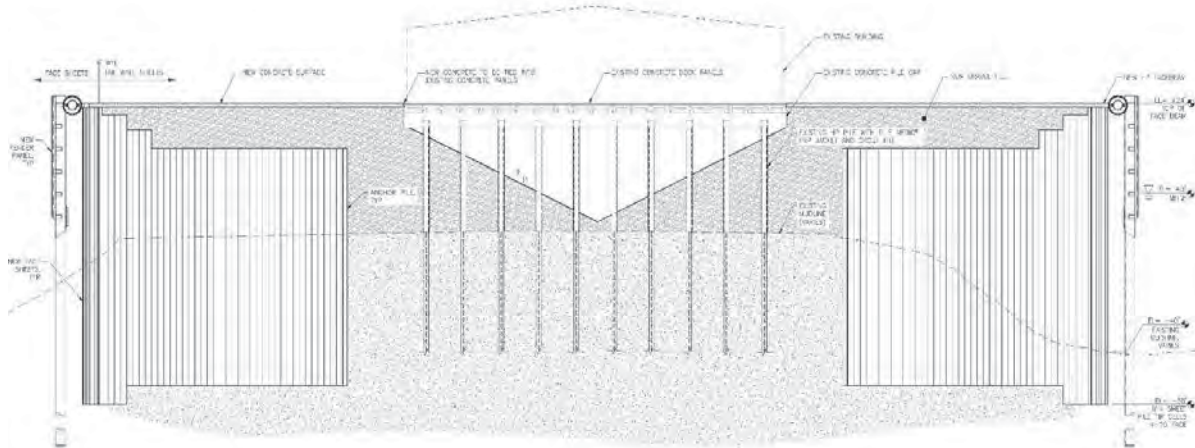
Option P-PD3 – Section of Sheet Pile With Existing Building Foundation Piles Reinforced
